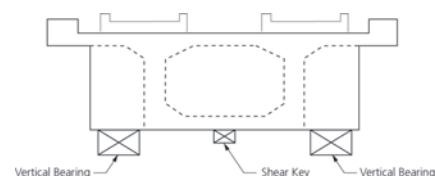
Widened abutment diaphragms to minimise uplift at bearings
